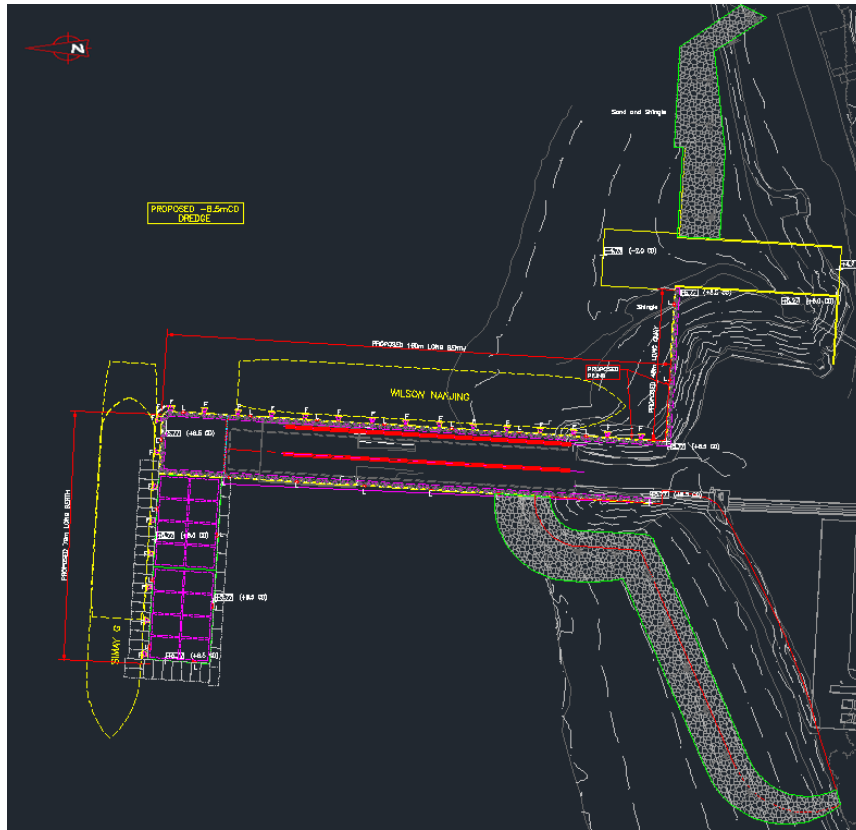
Schematic outline of the proposed development at Kyleakin Pier.
